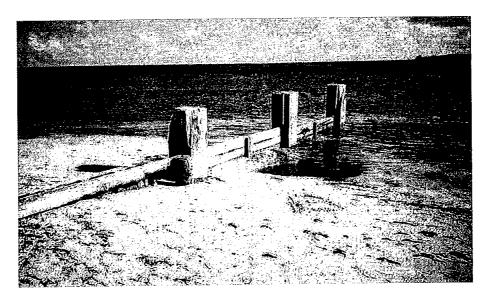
Photograph of King-Pile Addition to Timber Groin (Groin #13)
